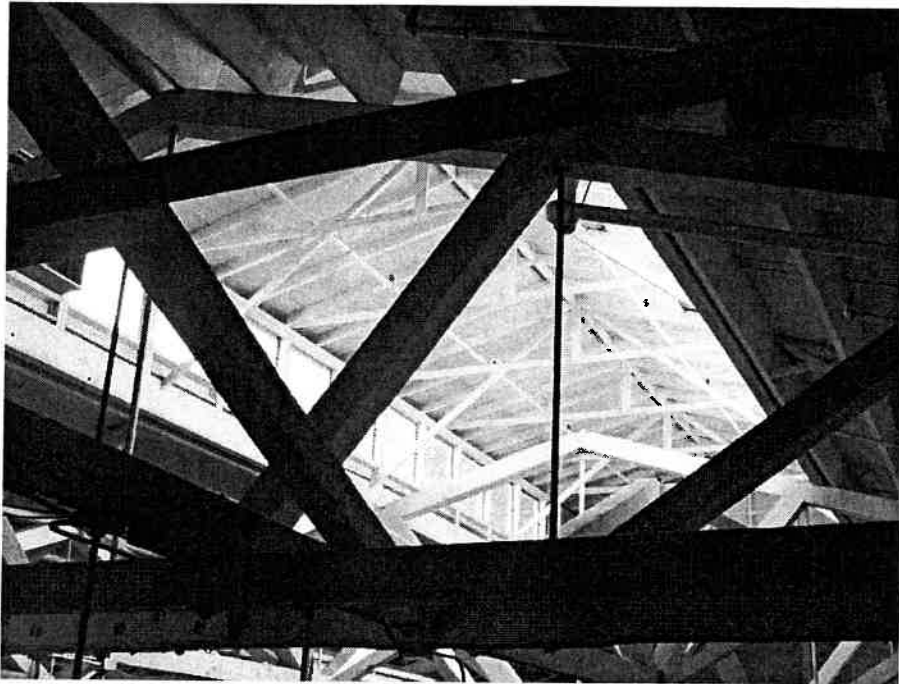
Photograph of wooden truss roof of c. 1919 portion of Building 800.
